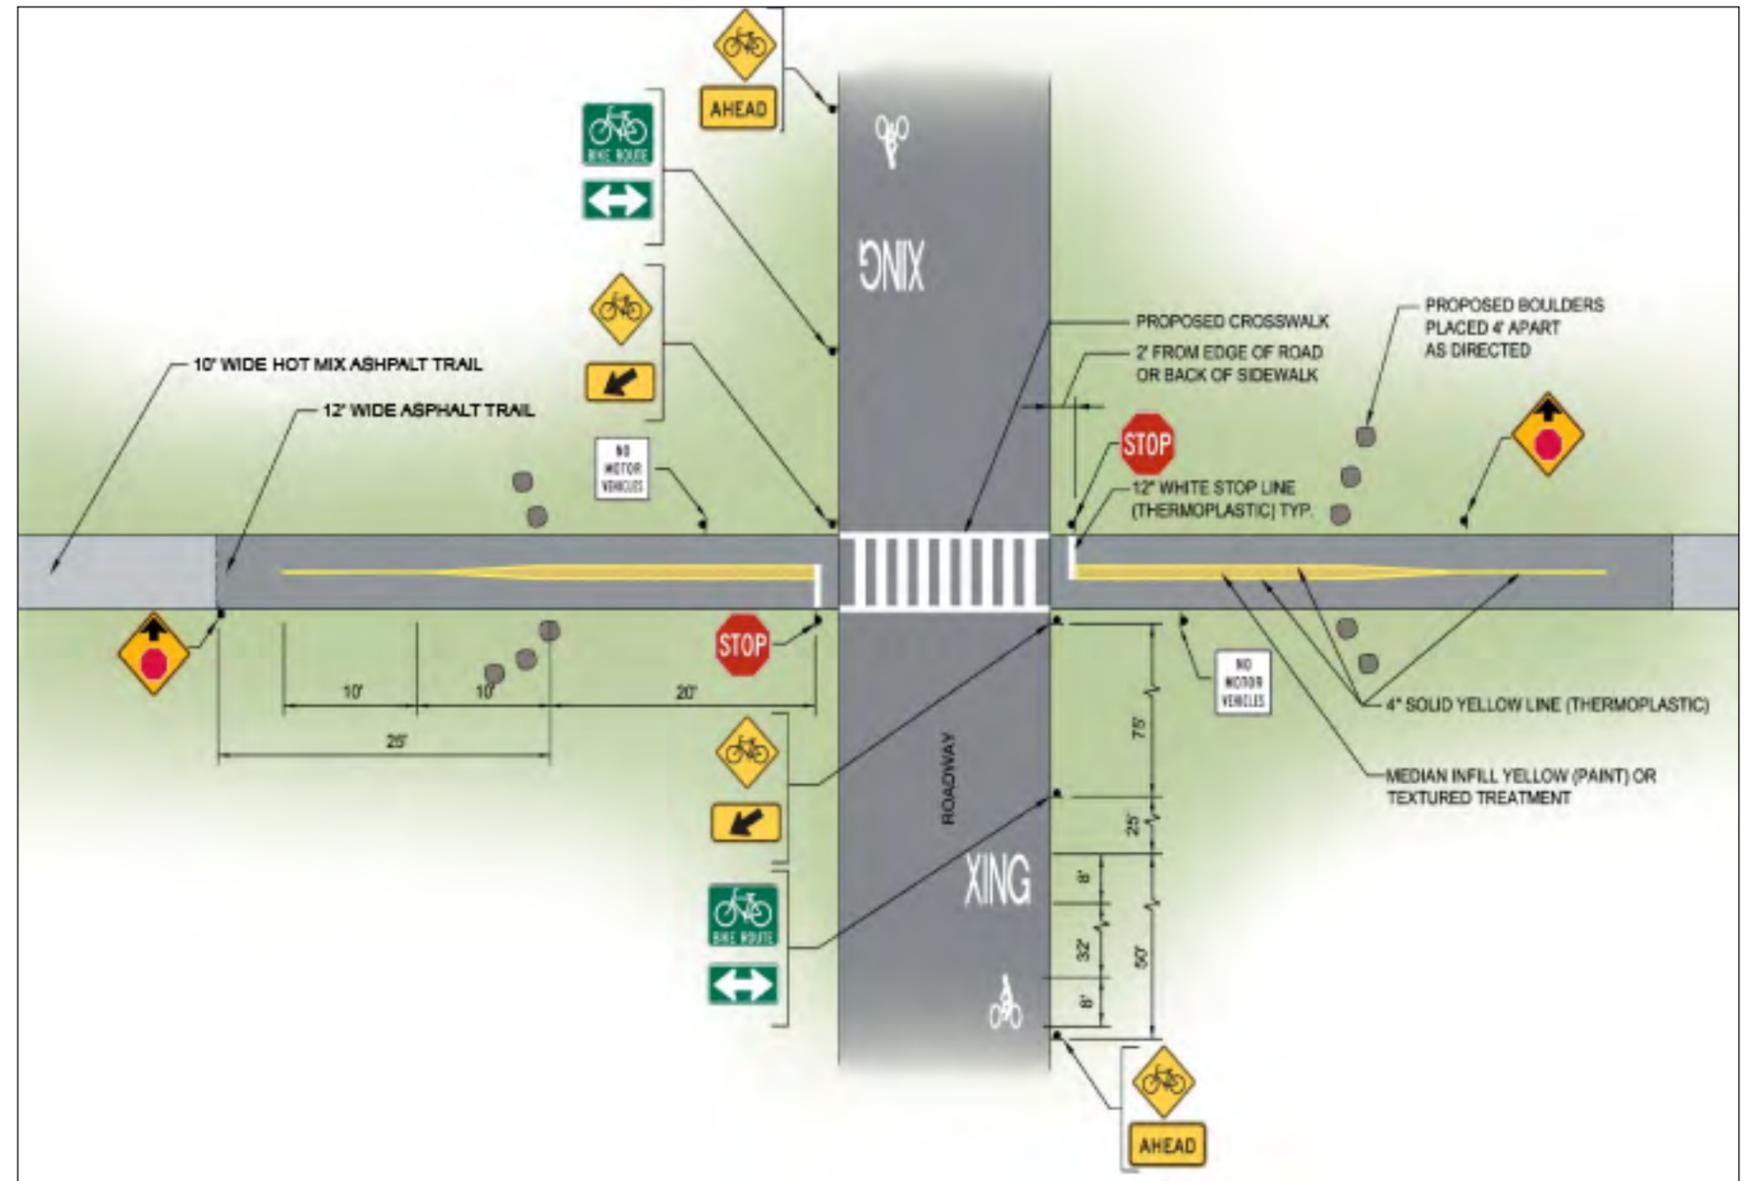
TYPICAL AT-GRADE TRAIL CROSSING LAYOUT
